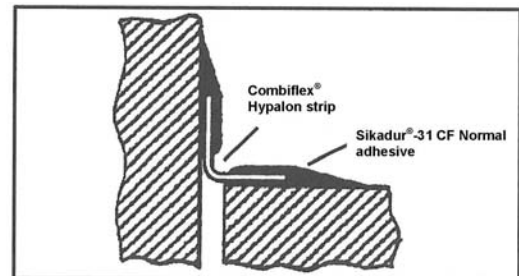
Wall to floor or ring beam or inverted configuration for a soffit joint.
